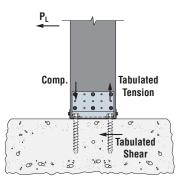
B-1 Two Anchors - One Anchor Shear, One Anchor Tension (tension from moment created from P_I) One anchor acting in shear due to 3/8" anchor in larger hole.
